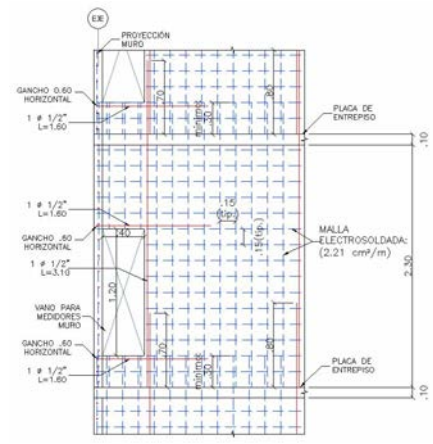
Typical reinforcement of a shear wall with openings (elevation). Seven story project. Photo courtesy of Alvaro P
